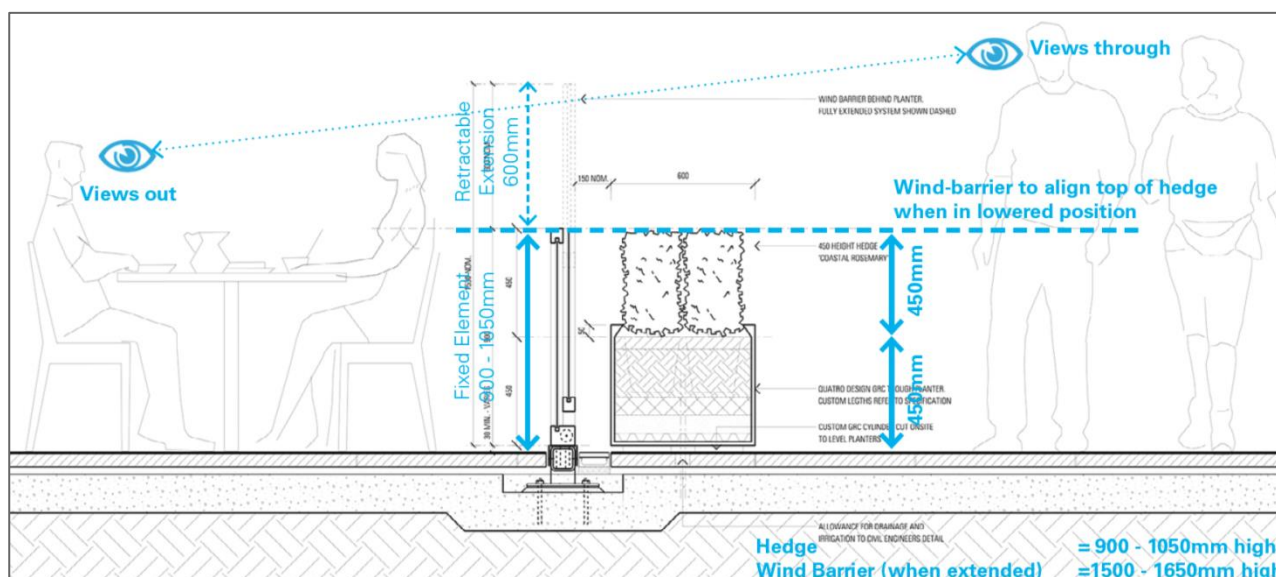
Detail of proposed planter boxes and retractable wind barriers
